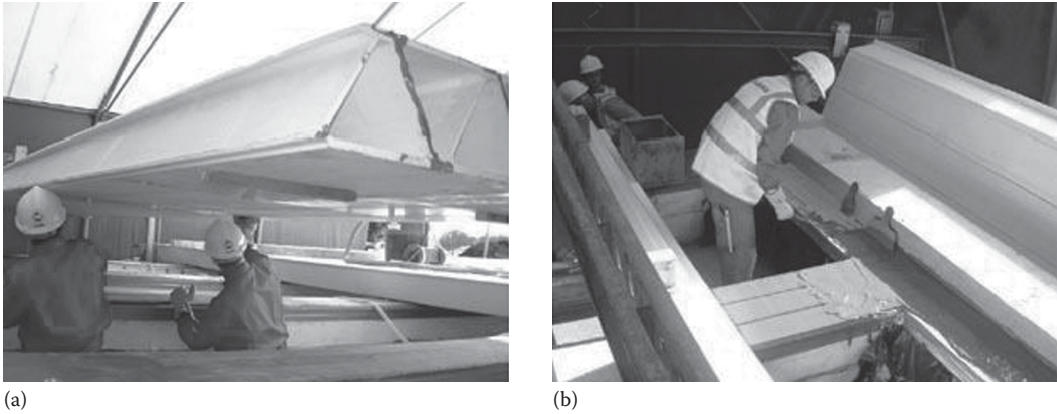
(a) Positioning of bonded ASSET deck panels and (b) bonding of ASSET deck panels onto FRP main beams. (Courtesy of Mouchel Parkman, Woking, U.K.)
